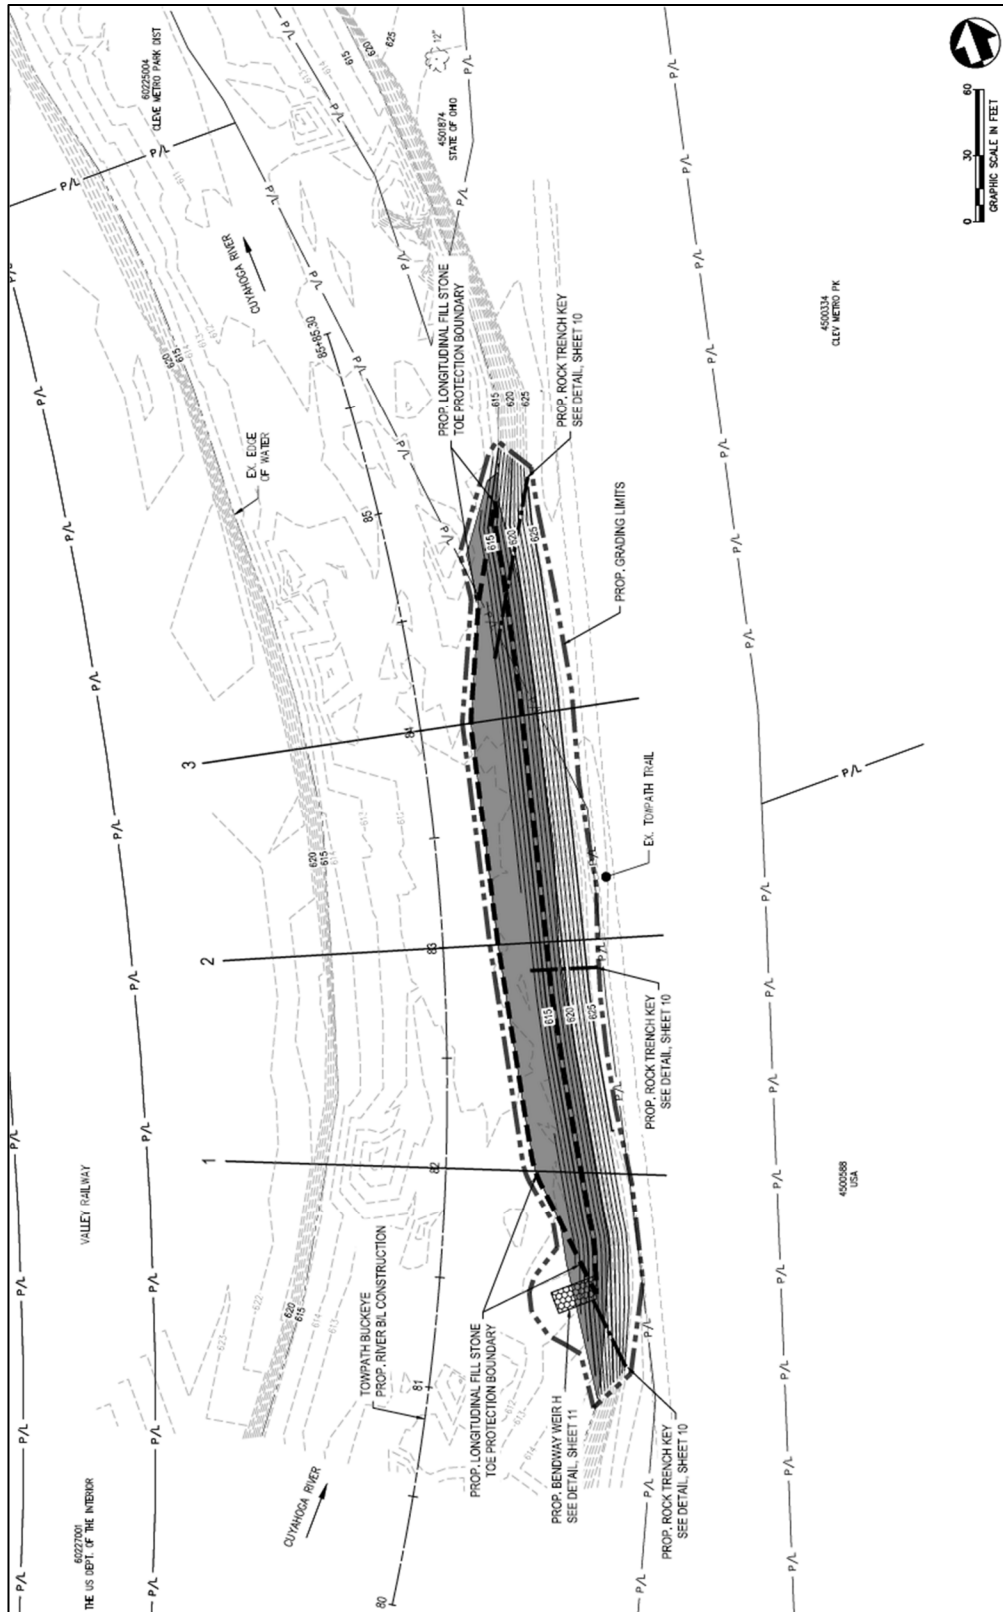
Towpath Trail: Buckeye: Proposed Grading Plan (from Sheet 35 of the Drawings)
